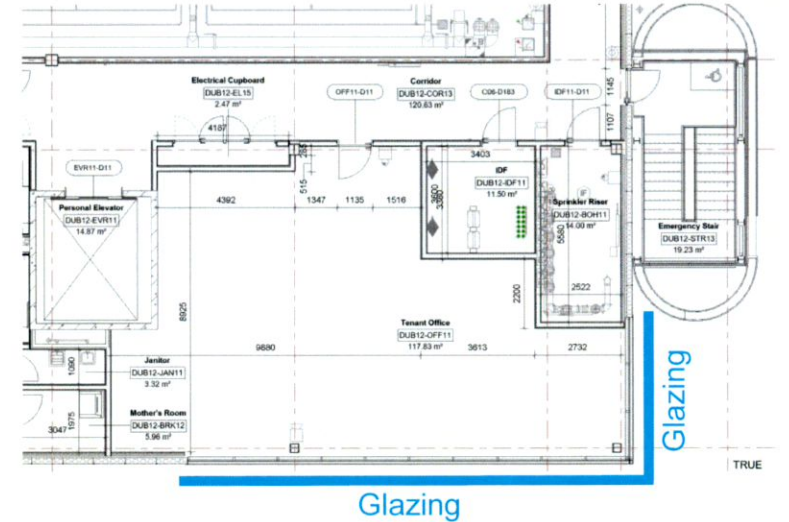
First Floor Plan of Proposed Glazing to the North-East Elevation, which encourages Passive Surveillance at the Falcon Avenue Roundabout
